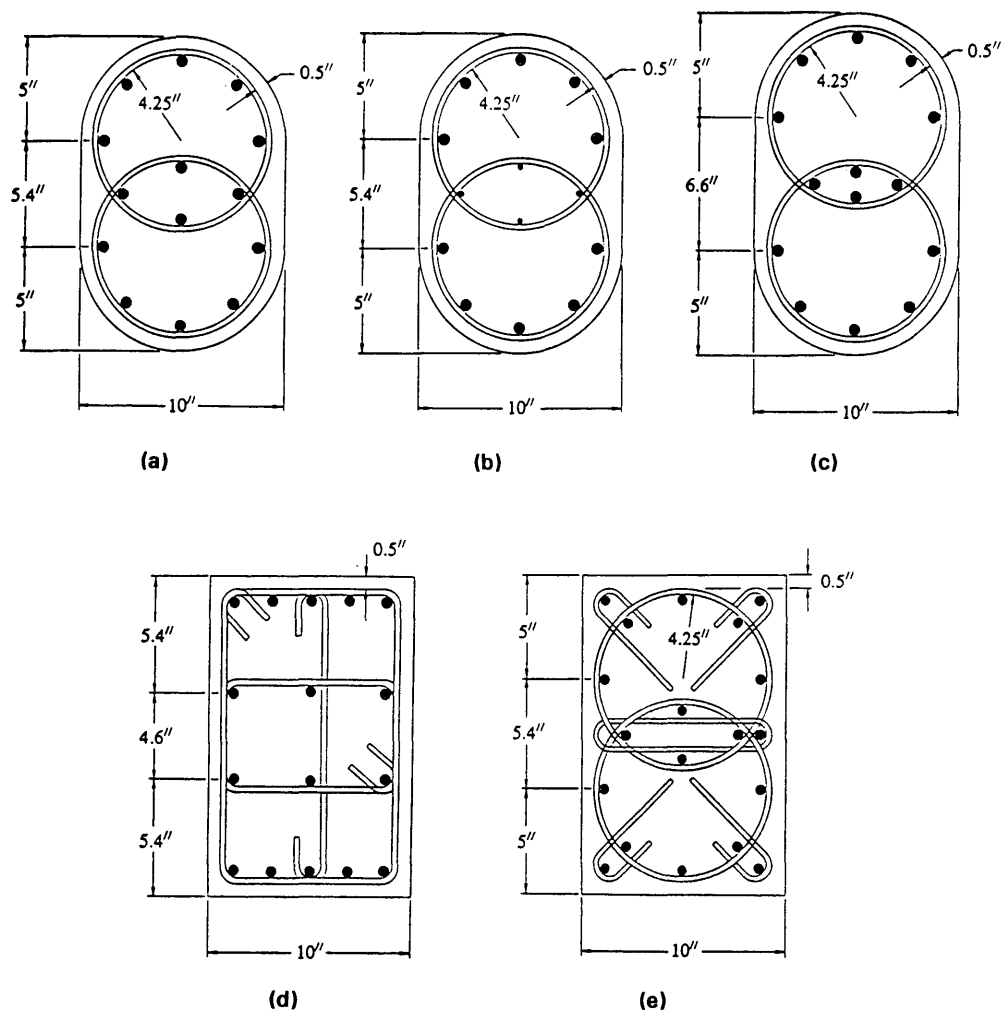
Column cross sections and reinforcement layout: *a*, Columns 1, 5, and 8; *b*, Column 4; *c*, Column 3; *d*, Columns 6 and 7; and *e*, Column 2.
